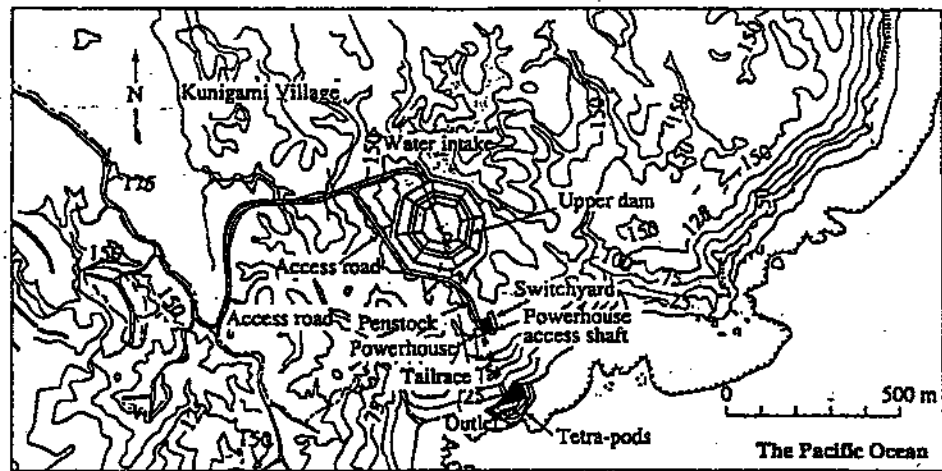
Plan View of Seawater Pumped Storage Power Plant
